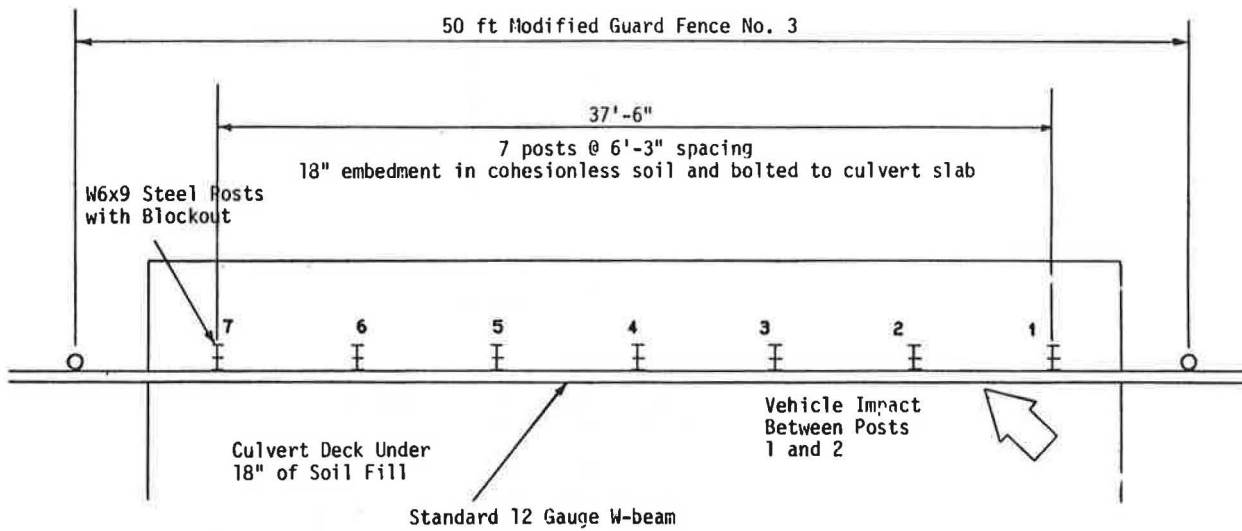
Plan view of modified guard fence No. 3 installation for Crash Test 3.
